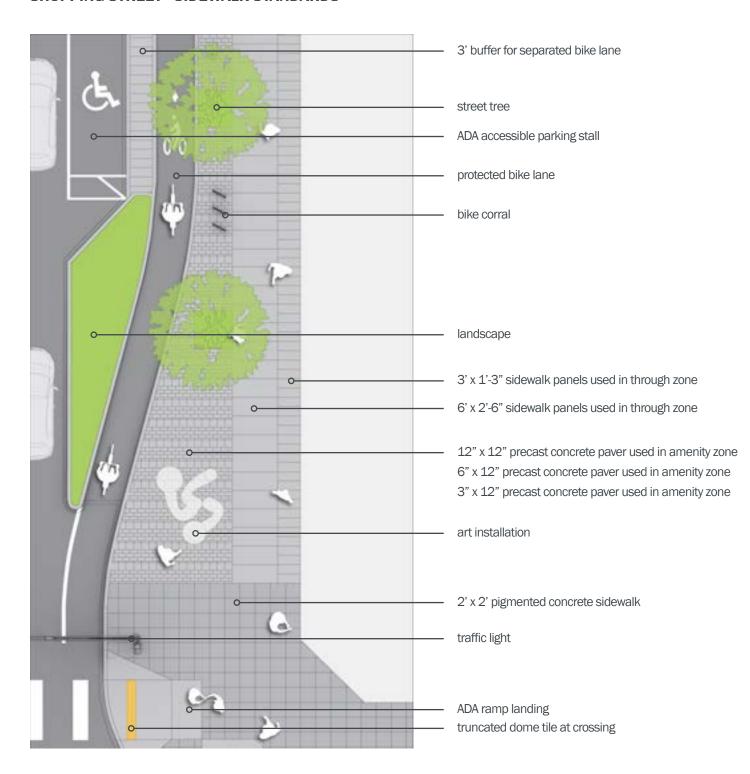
Sidewalk standards for the Shopping Street. Design elements should match design developed by the City of Bellevue for 130th.
